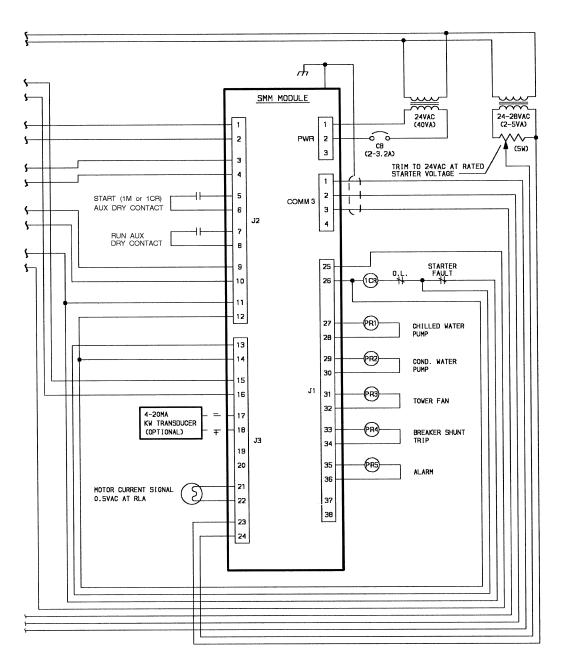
Chiller Power Panel, Starter Assembly, and Motor Wiring Schematic (cont)
